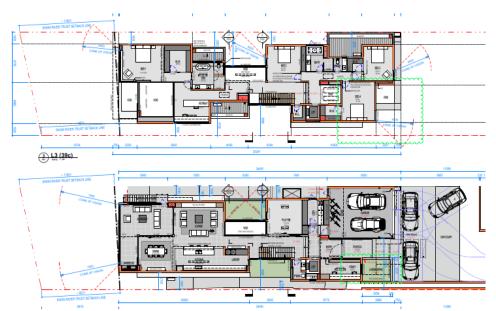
Ground floor and first floor of the approved development at 40B Fraser. Areas highlighted in green will have a view of the proposed development
